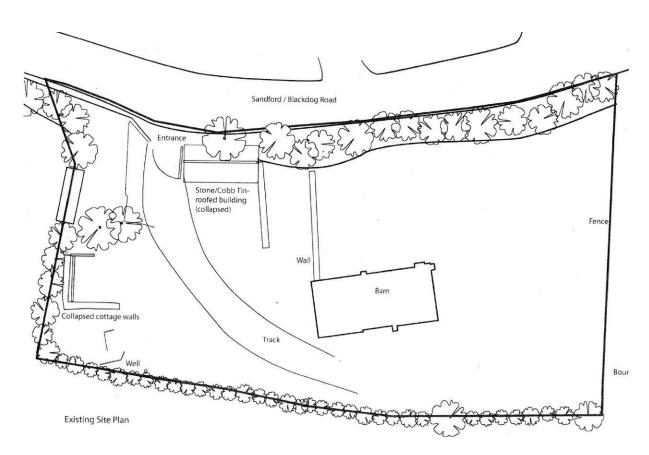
Site plan, showing extent of development area and standing buildings. From drawing E04, by New British Design, 2006. Not reproduced to scale.
